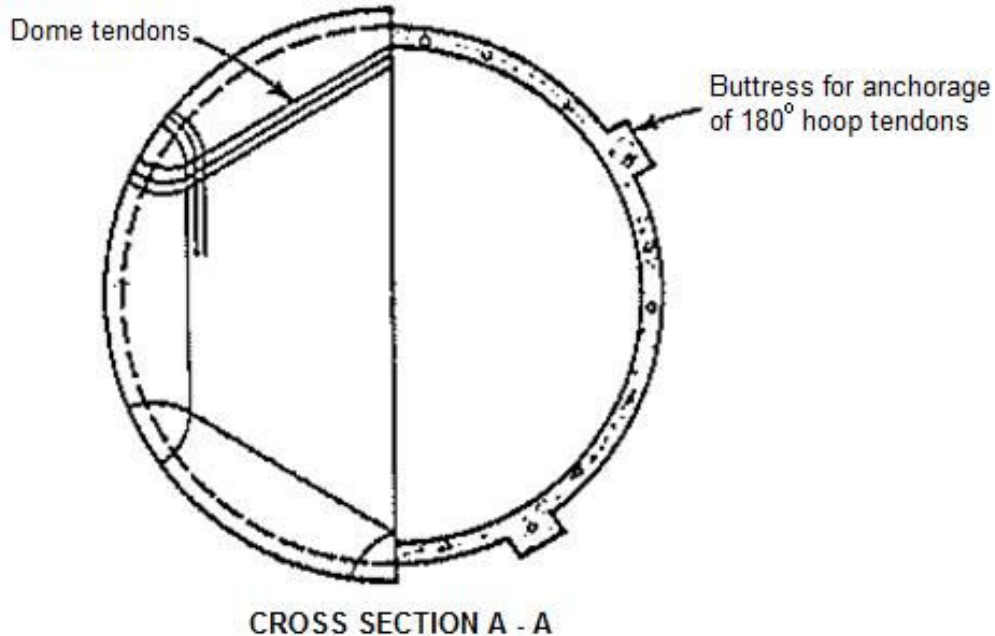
Steel-lined post-tensioned concrete containment for Pressurized Water Reactor: Cross Section A-A
